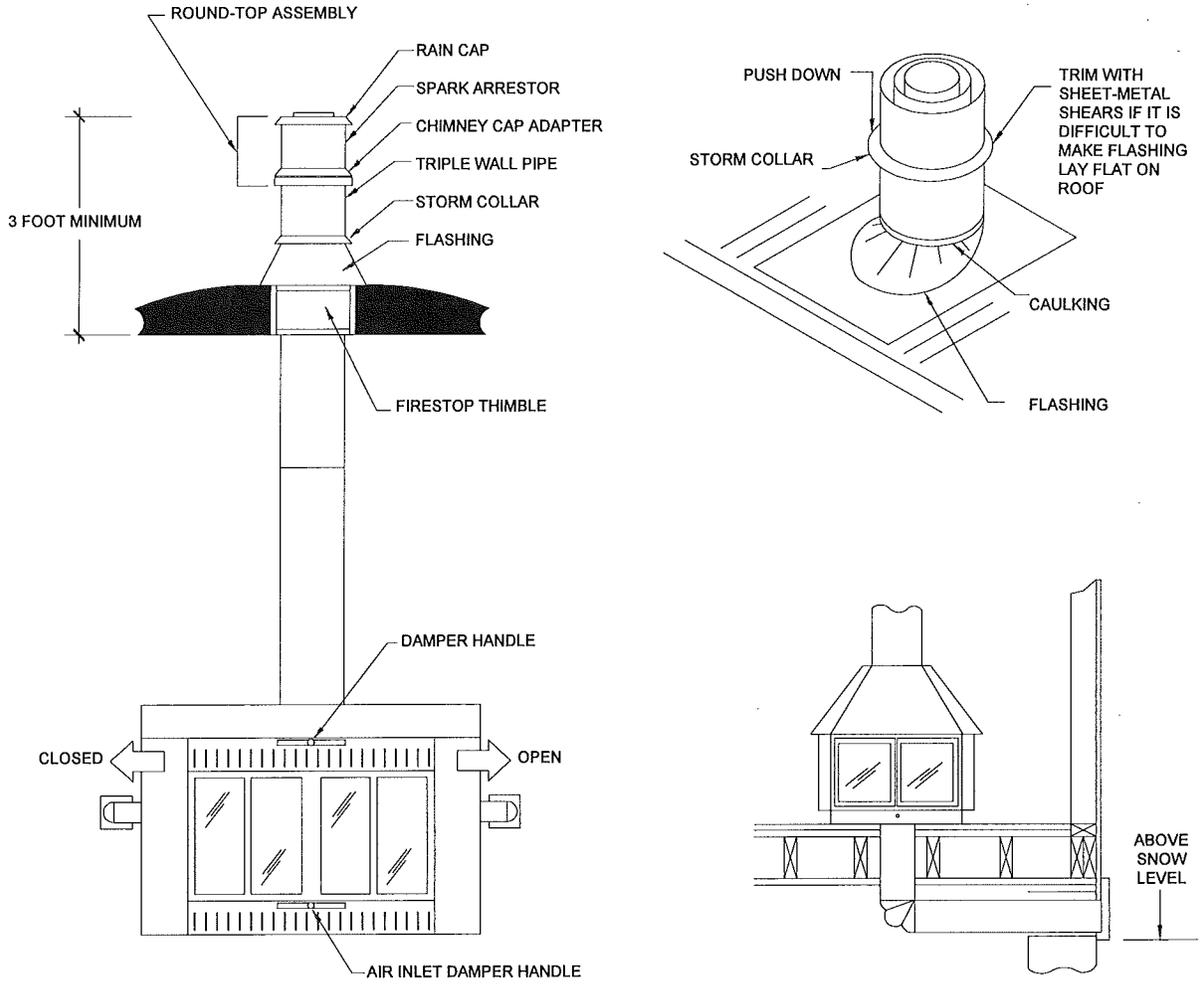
FIREPLACE CHIMNEY AND AIR INTAKE INSTALLATION
